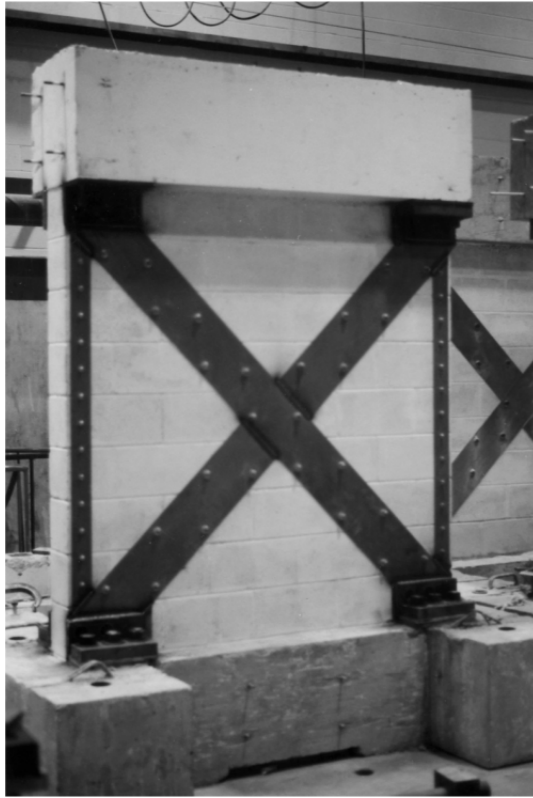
Steel strip placed to retrofit the reinforced masonry wall (Taghdi, et.al. 2000)
